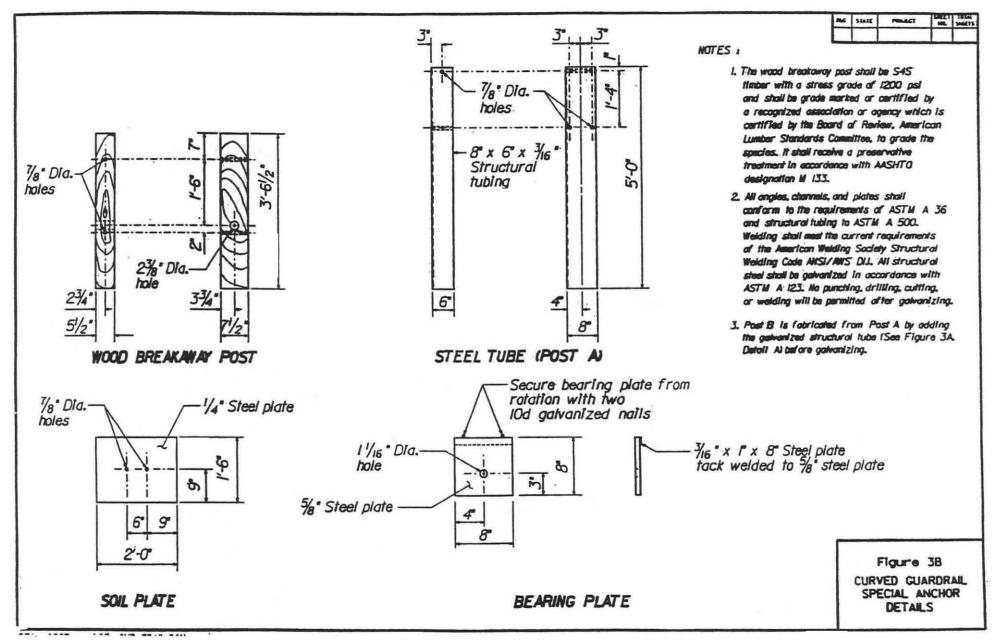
FHWA Technical Advisory Drawings for Short Radius Guardrail Designs (9)
